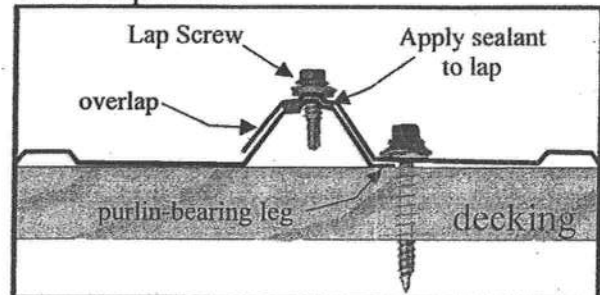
On low-pitched roofs butyl tape or caulk should be applied at the panel lap to keep water from overflowing the lap. Note that the underlap side of the panel has a short purlin-bearing leg that rests on the roof decking.
